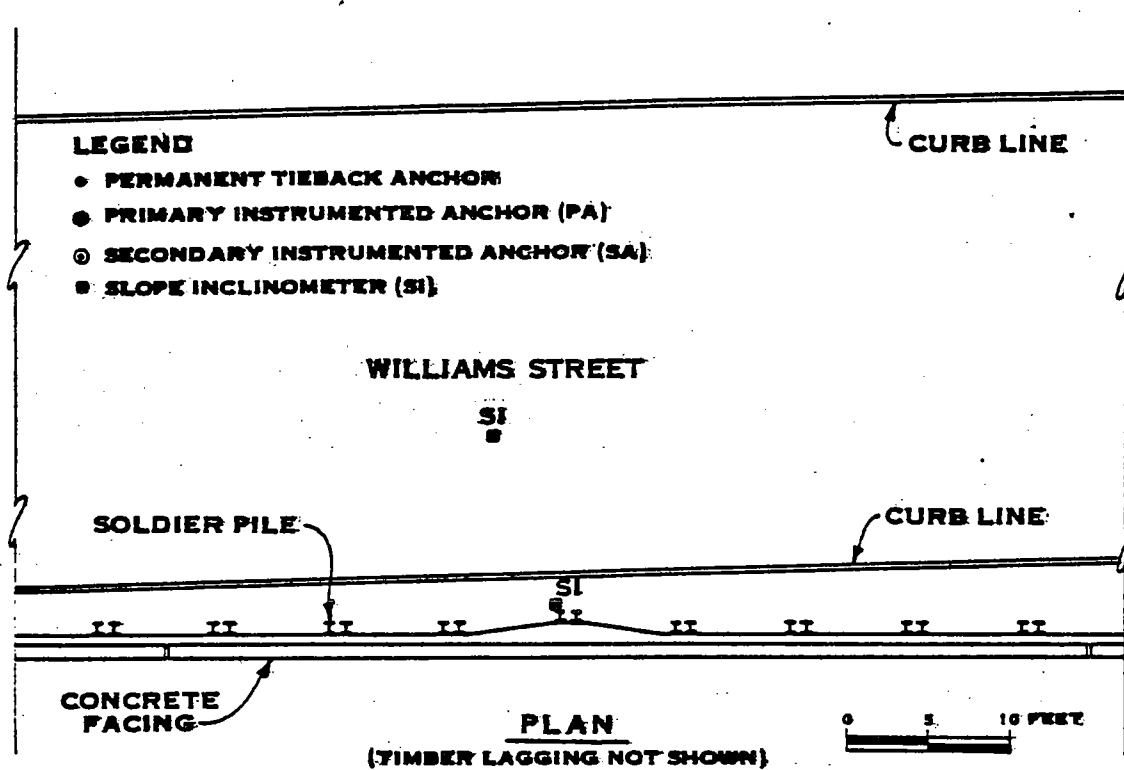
PERMANENT TIEBACK WALL INSTRUMENTATION
